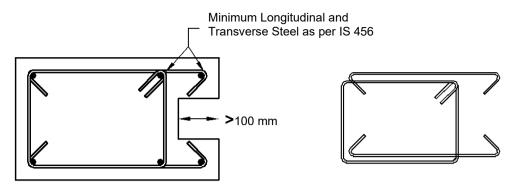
REINFORCEMENT REQUIREMENT IN COLUMNS WITH PROJECTION MORE THAN 100 MM BEYOND CORE
